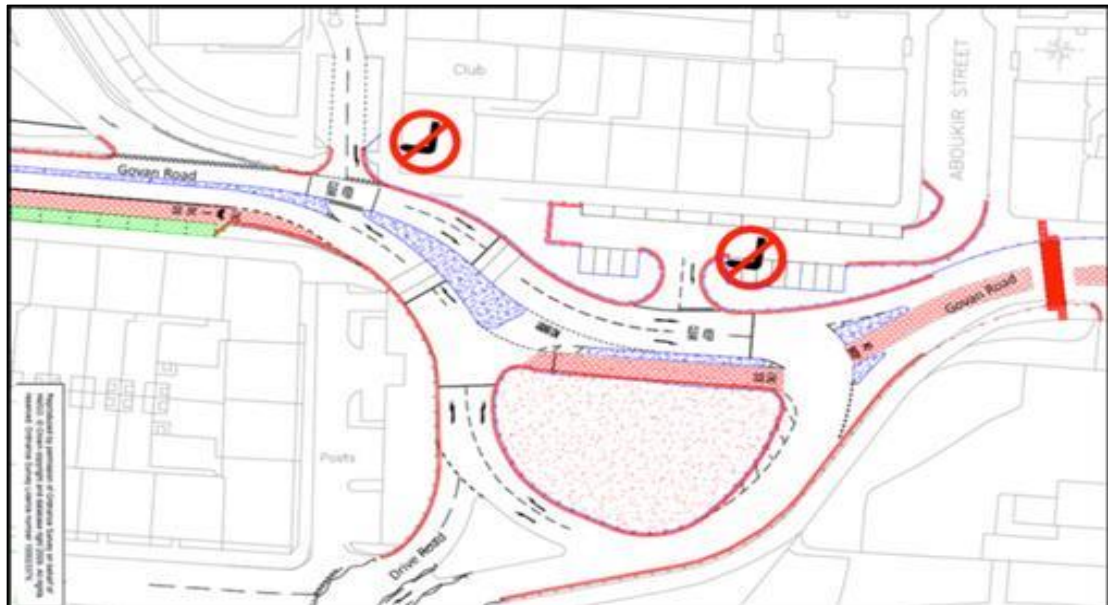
Aerial plan of a roundabout in Govan (Wright and Hook, 2007)
